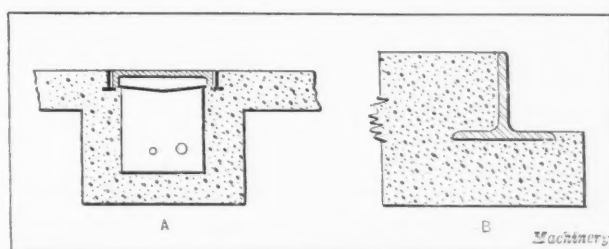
(A) Cross-section of Oil-pipe Trench; (B) T-iron embedded in Trench Wall
